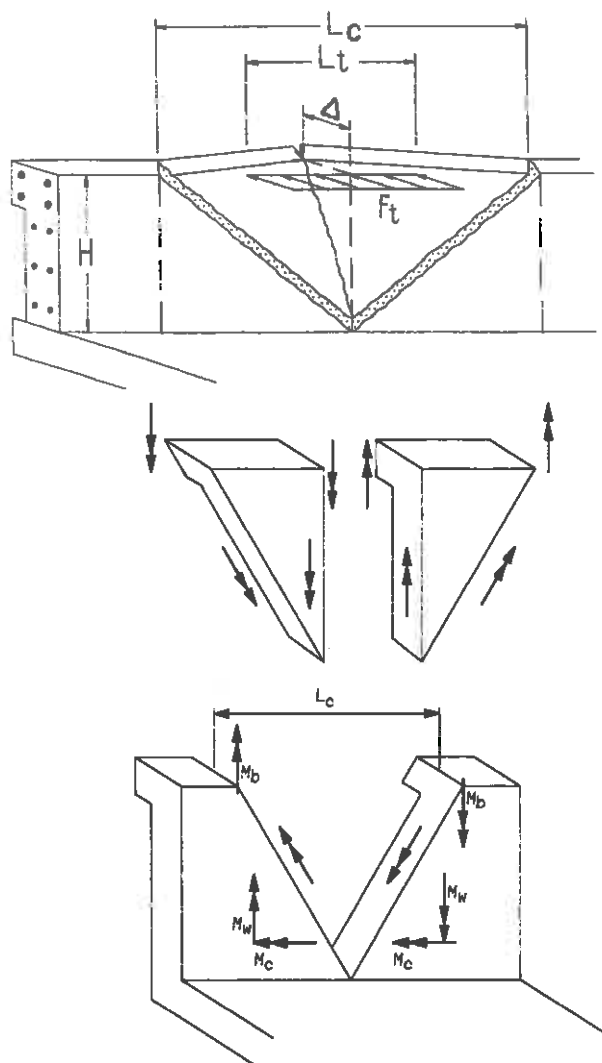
Yield Line Analysis of Concrete Parapet Walls for Impact within Wall Segment
